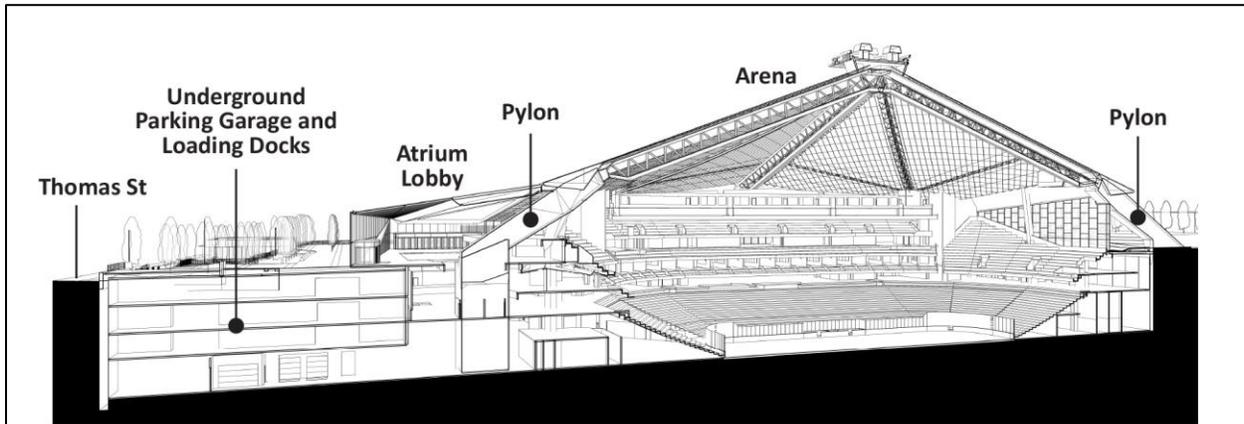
Alternative 1: OVG Proposal –Cross Section – Showing Arena and Underground Parking Garage and Loading Dock
